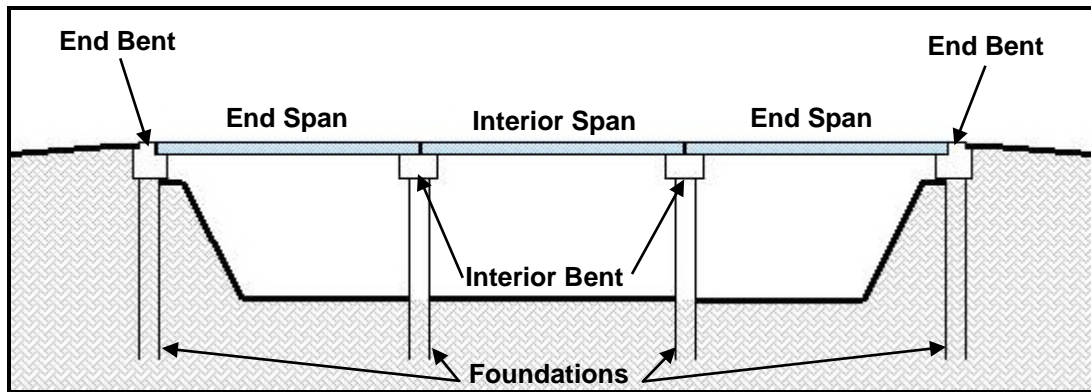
, Bridge Layout (Simple or Continuous Span)
